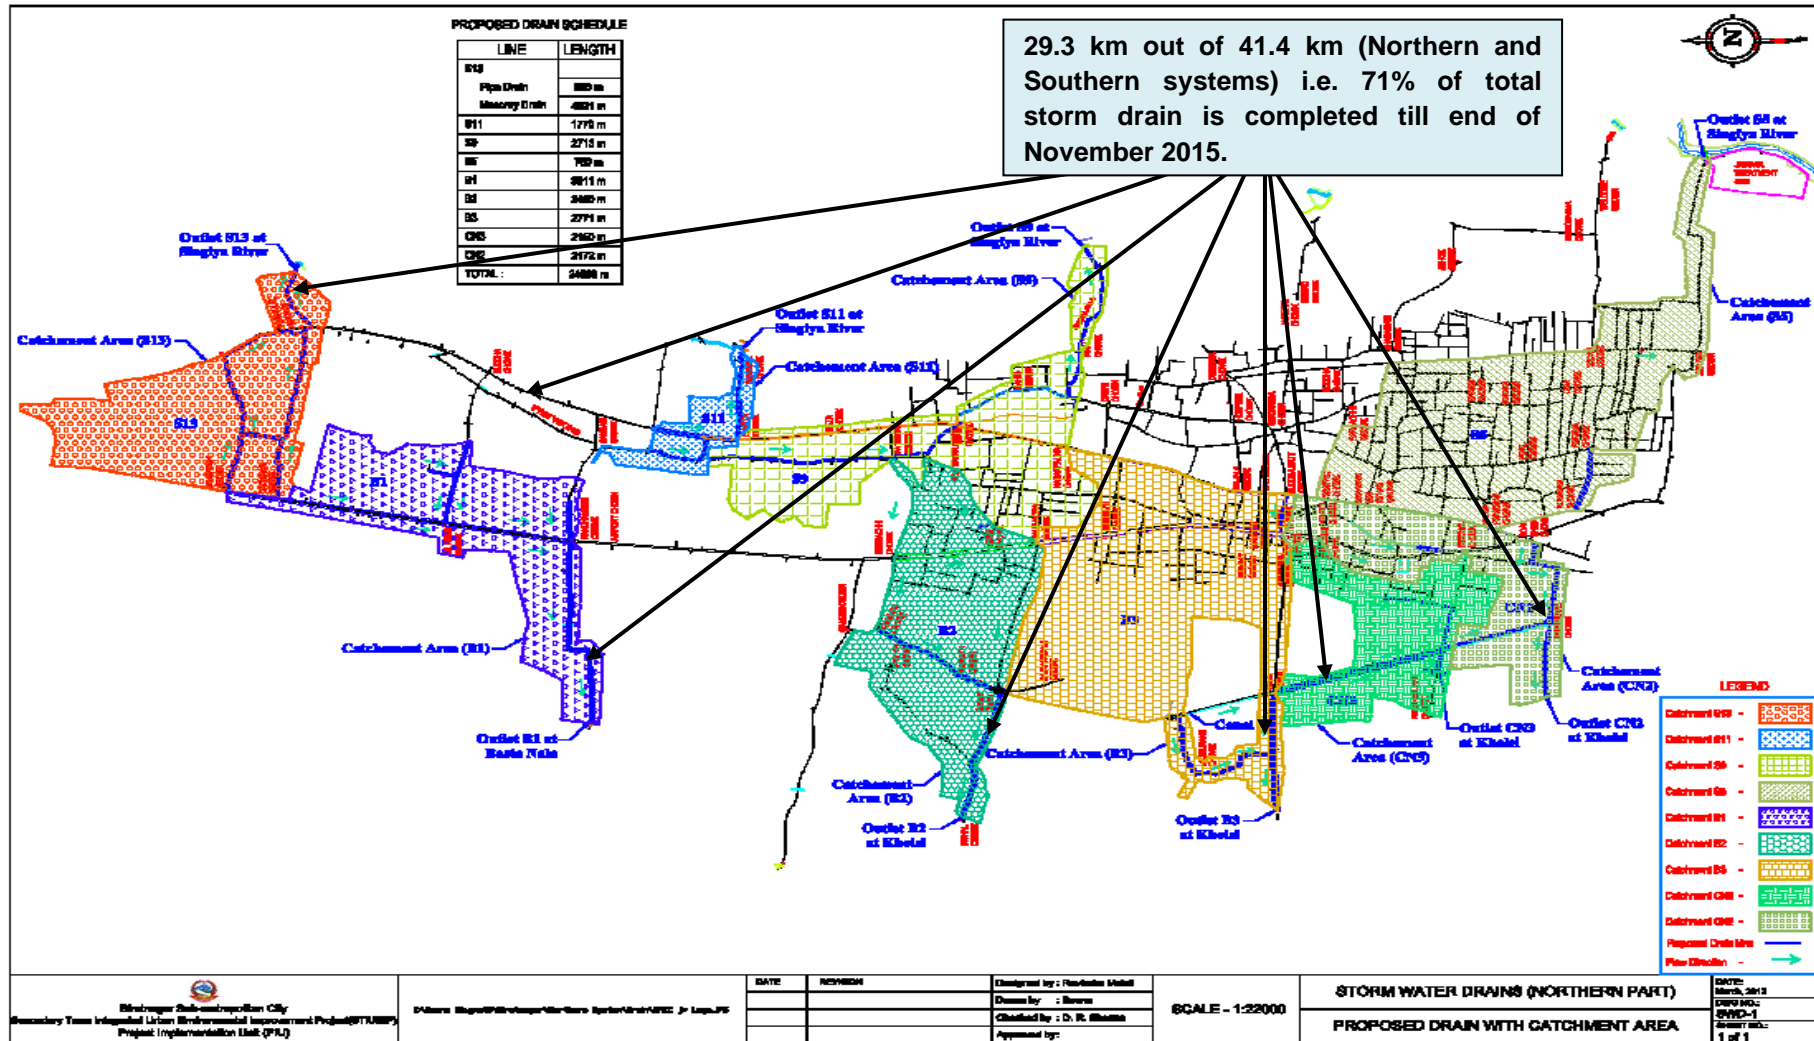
Proposed Storm Water Drains in BSMC (Northern Drainage System)
